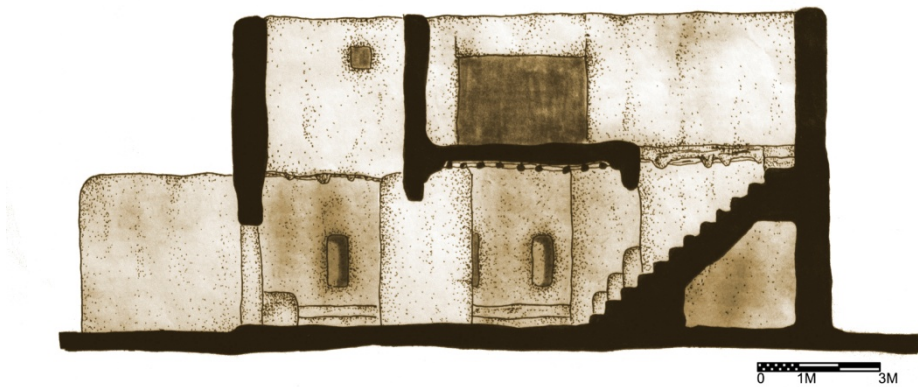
Section in the building showing the height of the internal court and gathering hall serving the function of the building.
